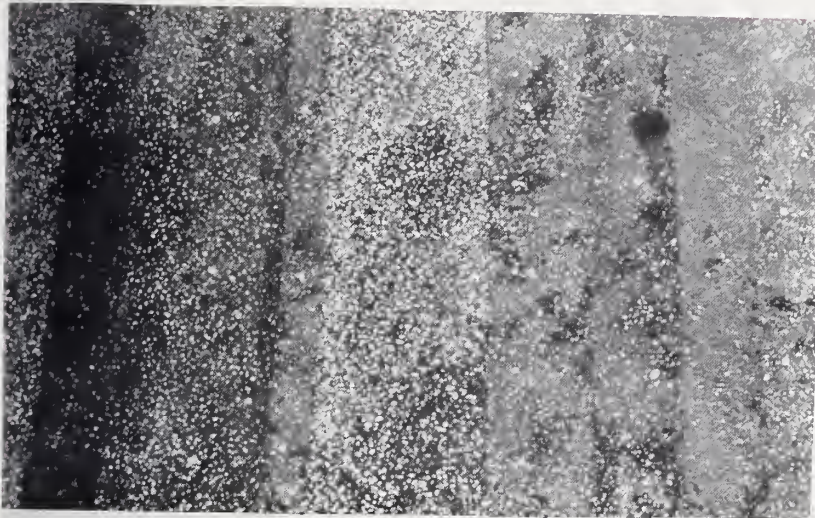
$\frac{1}{4}$ -in. alumina cement-later monolithic composition on cement-mortar subfloor (test panel 11L).
